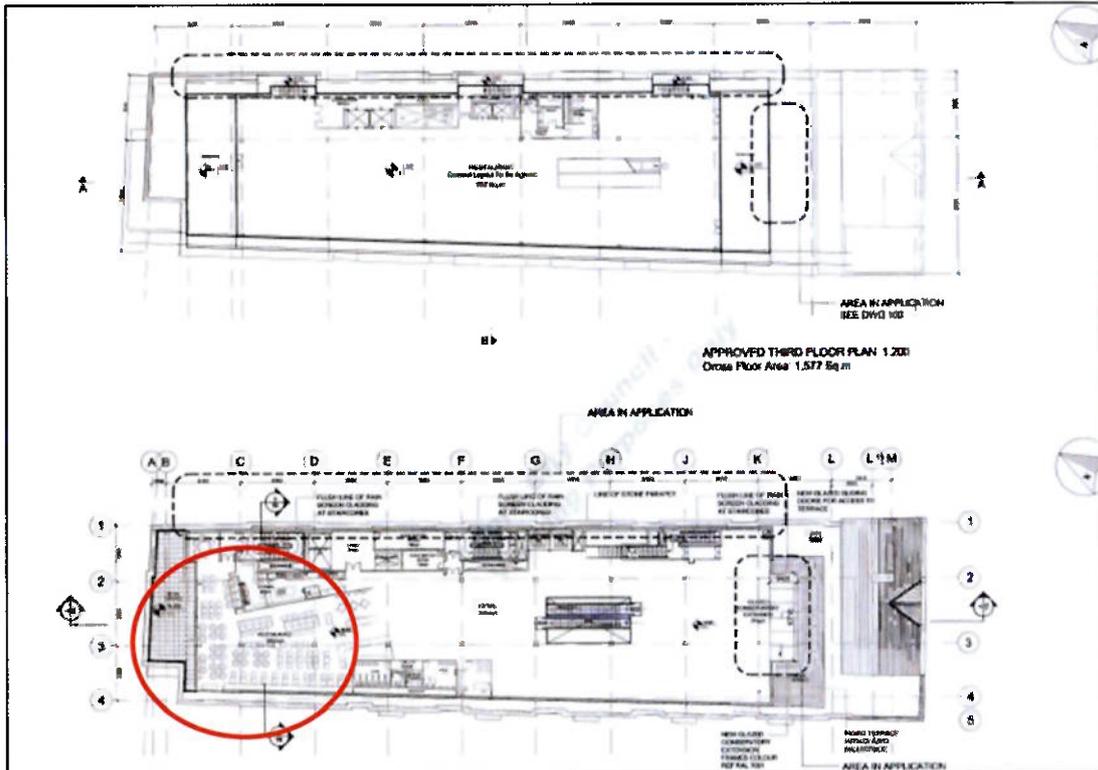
Pa Ref 08/33461 – third floor plan including restaurant.
